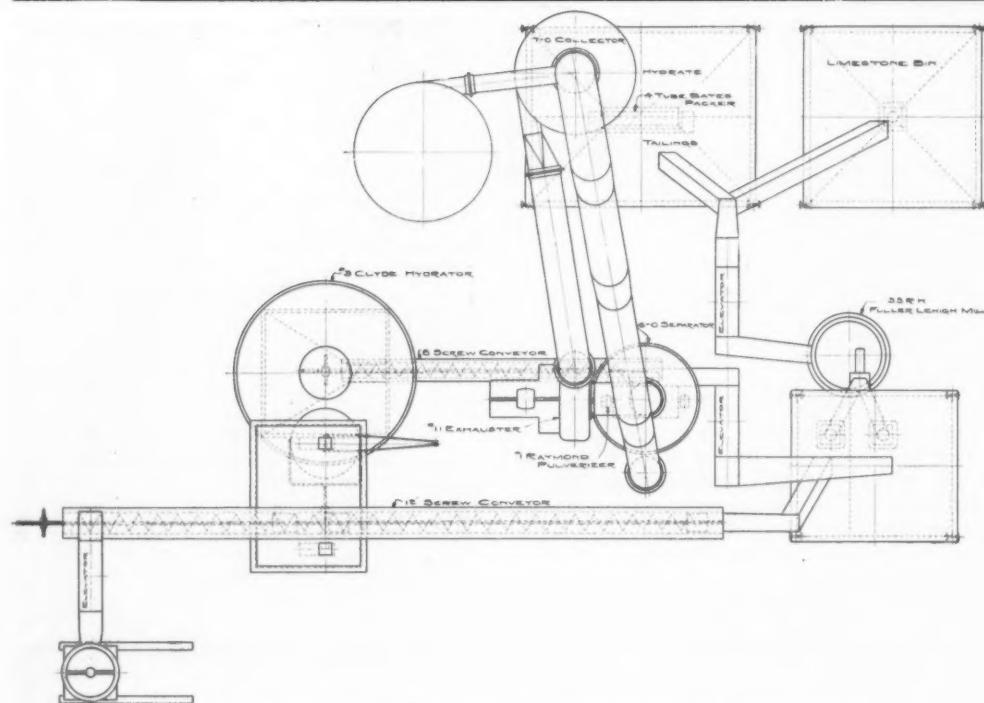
FLOOR PLAN OF HYDRATING PLANT OF DUTCHESS COUNTY LIME CO.
